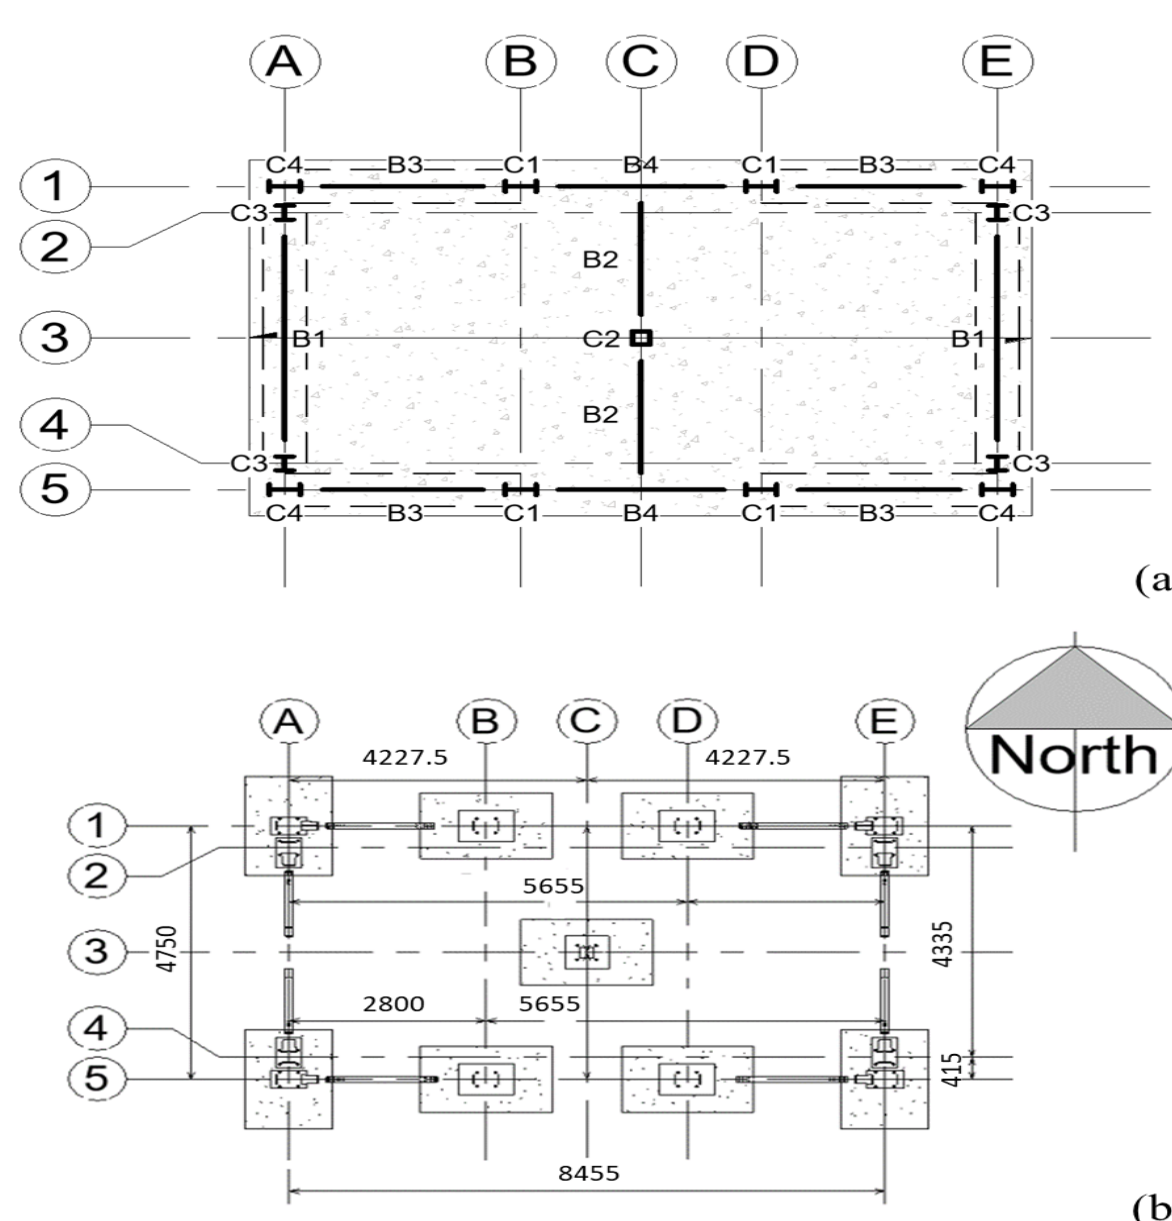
Plan layout on each level for both MRF and BF systems (a) frame section and (b) dimension.
